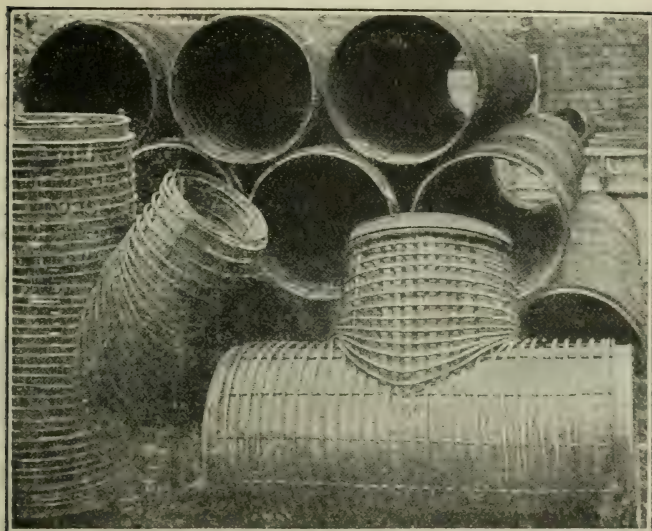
“Bonna” Pipe : Reinforcement of Junctions.
